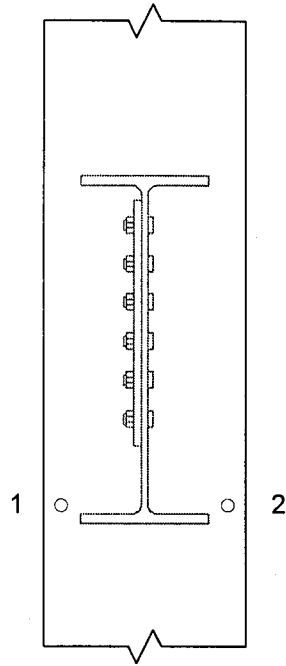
AE Transducer Locations (East Connection of Specimen 1)
